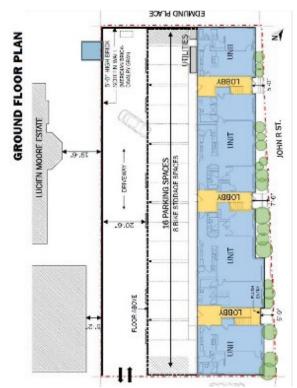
Showing originally approved Site Plan with location of screen wall between 104 and 112 Edmund.
